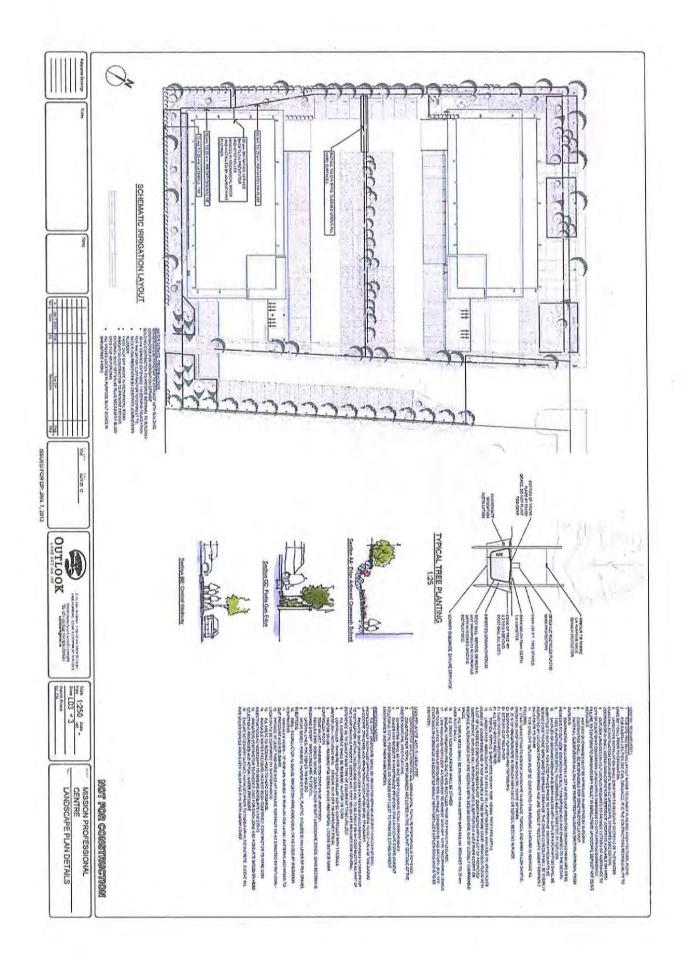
DETAIL VIEW OF INTERNAL PEDESTRIAN WALKWAY
